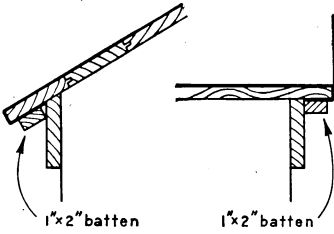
Battens for holding the edges of roll roofing at eaves.
